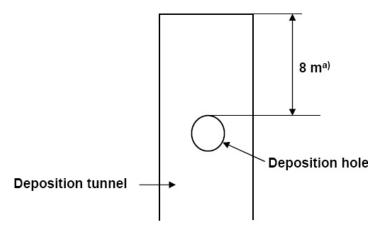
Schematic plan view of main tunnel, deposition tunnel and deposition holes (from /SKB 2004a/).
